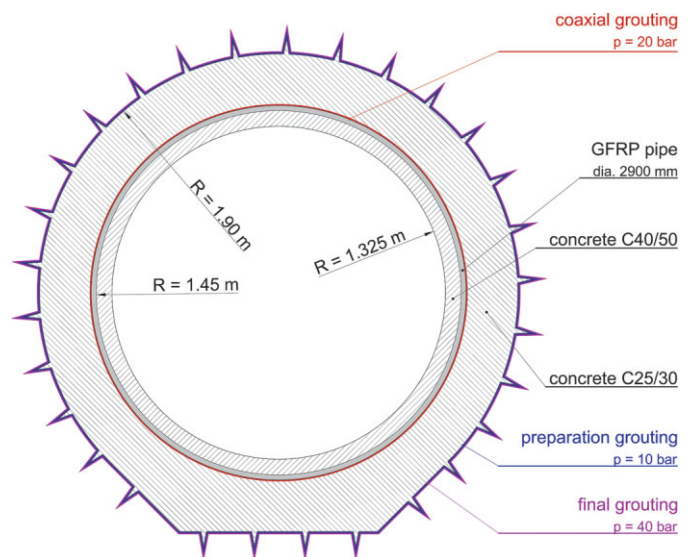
Cross section of the GFRP-lined part of the tunnel
